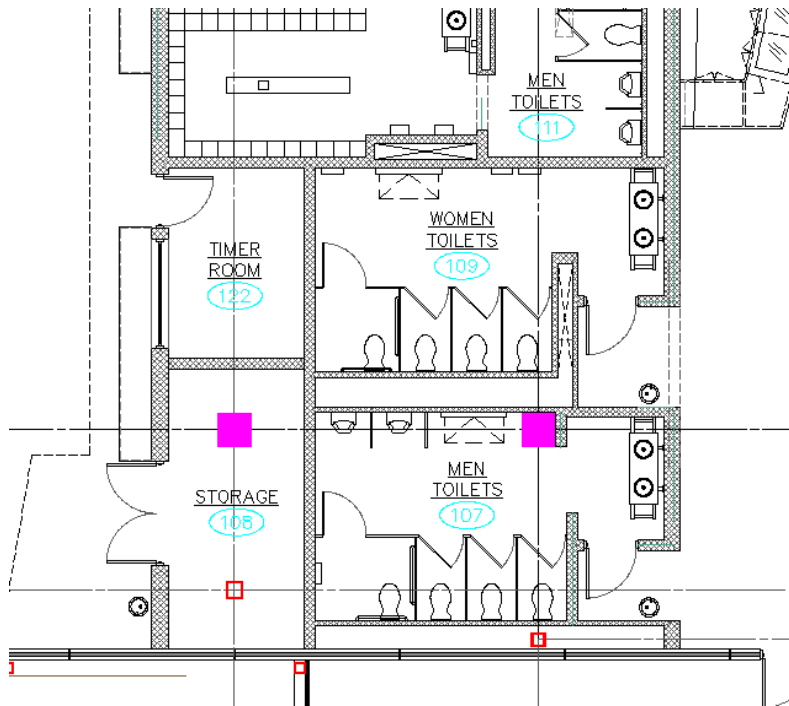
Men's Restroom, Women's Restroom, Timer Room and Storage Room (Ground Level)
